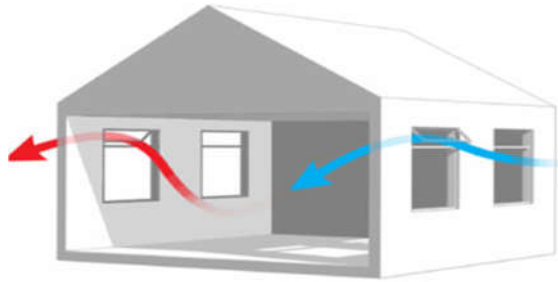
Natural Ventilation Diagram in Building Design [23]
